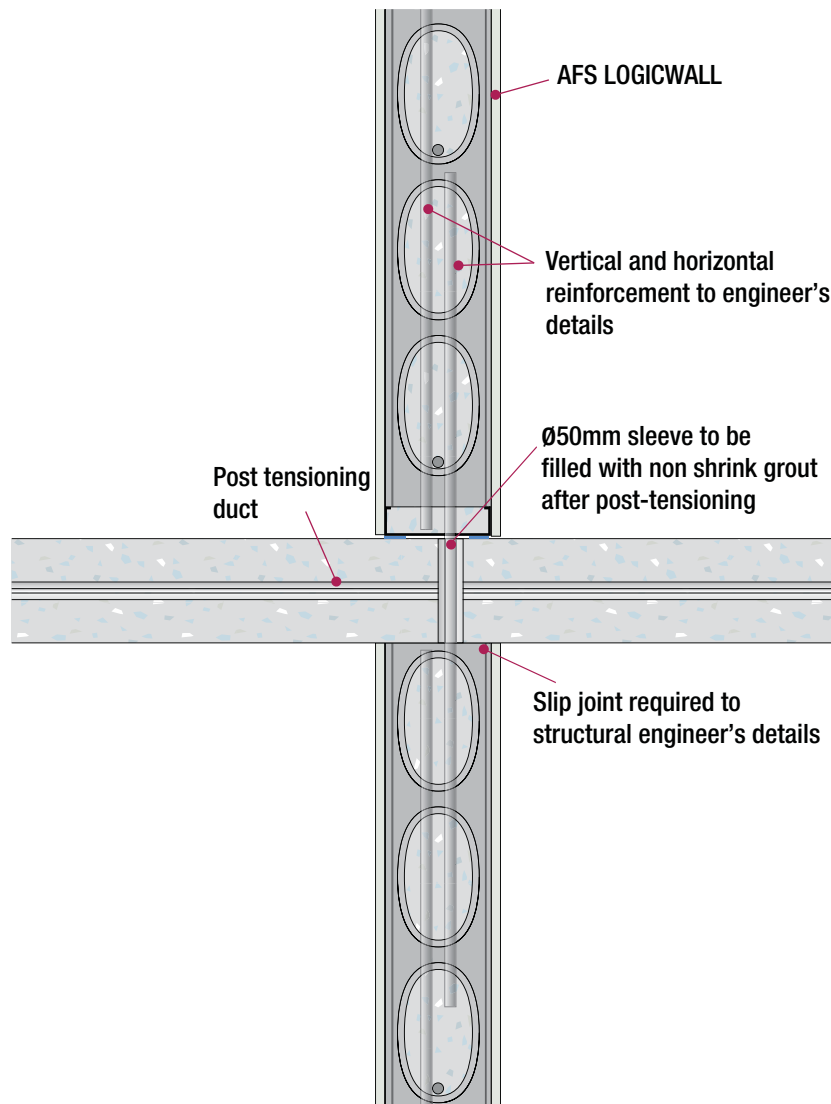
Post-tensioned Slab To AFS Logicwall® (Internal) Wall
